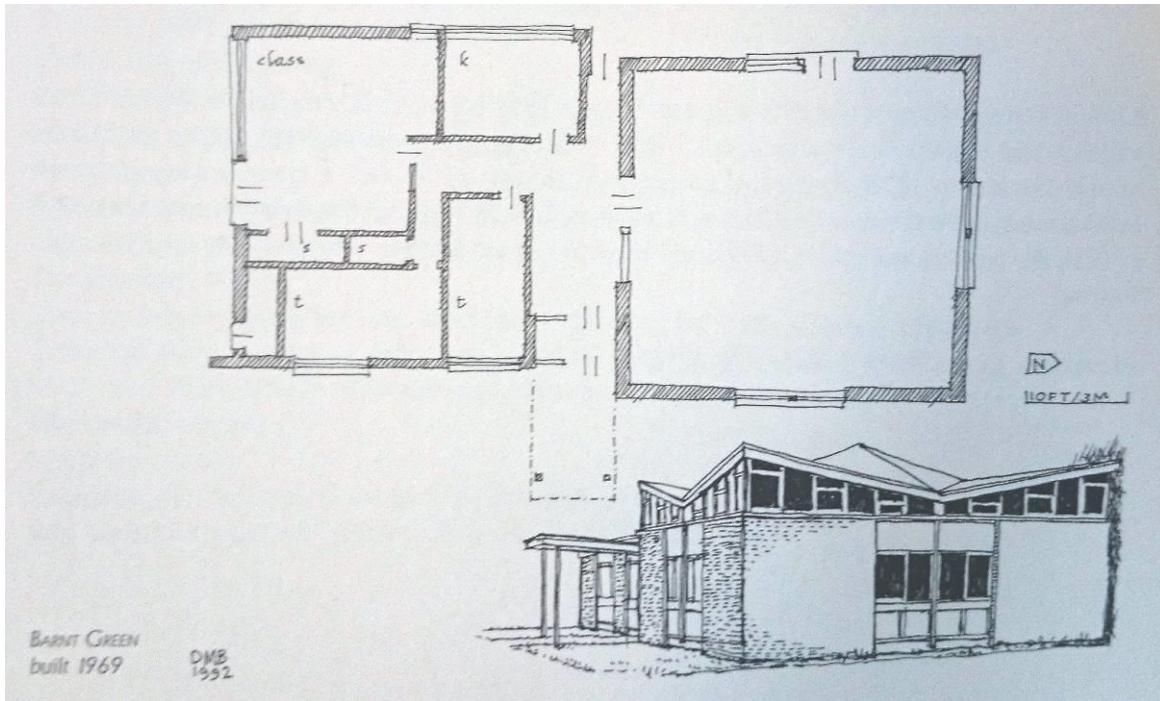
Ground floor plan of the meeting house as reconstructed by Butler (north to the right; not to scale) (Butler (1999), vol. 2, p.692)
